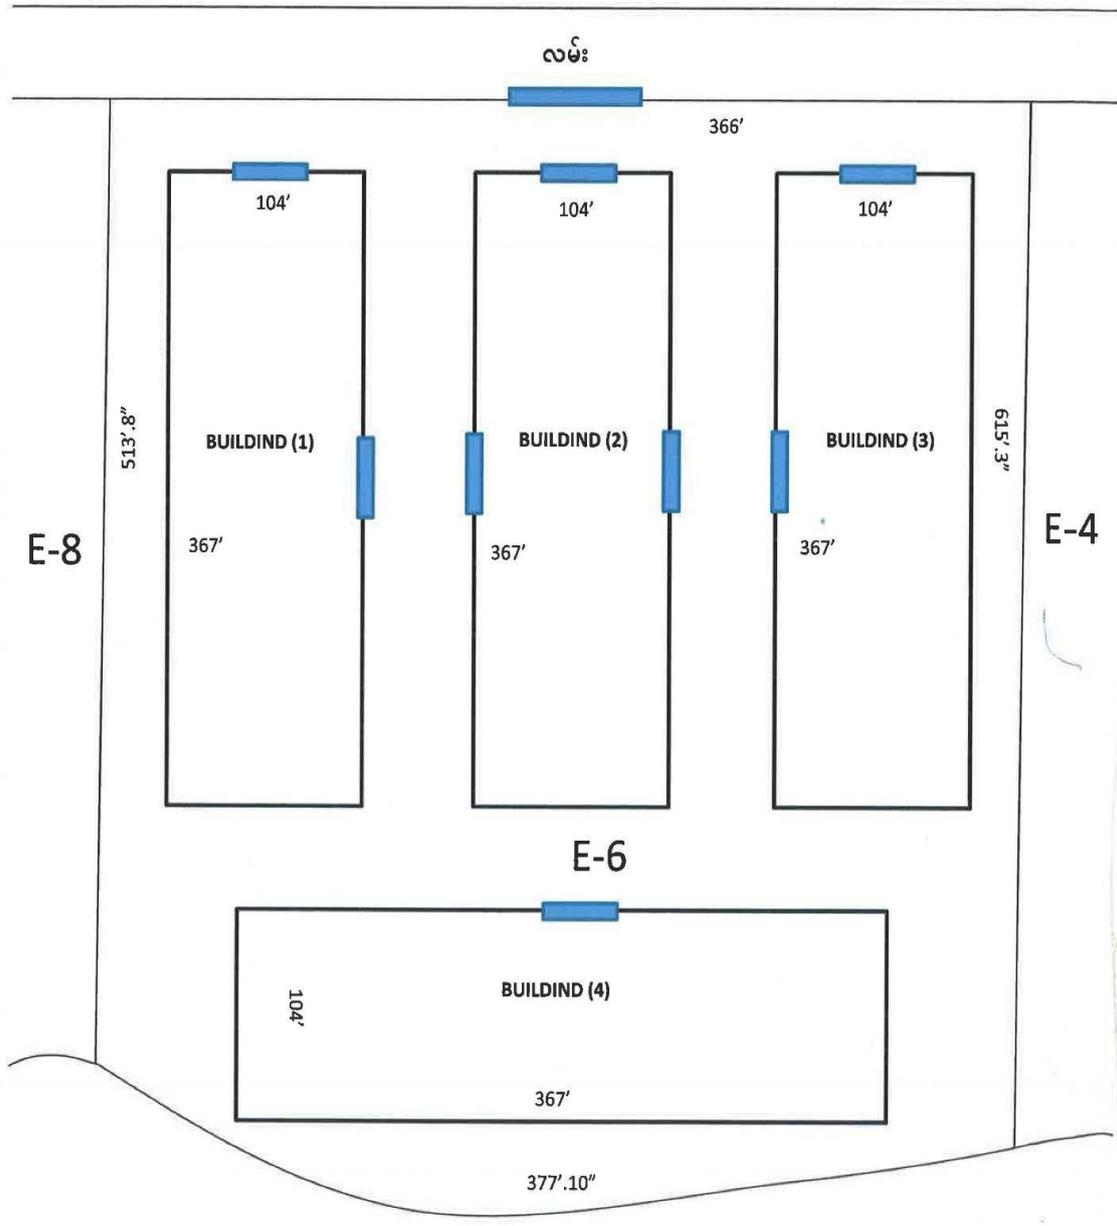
Layout Plan for Myanmar Rui Xin Shoes Company Limited
